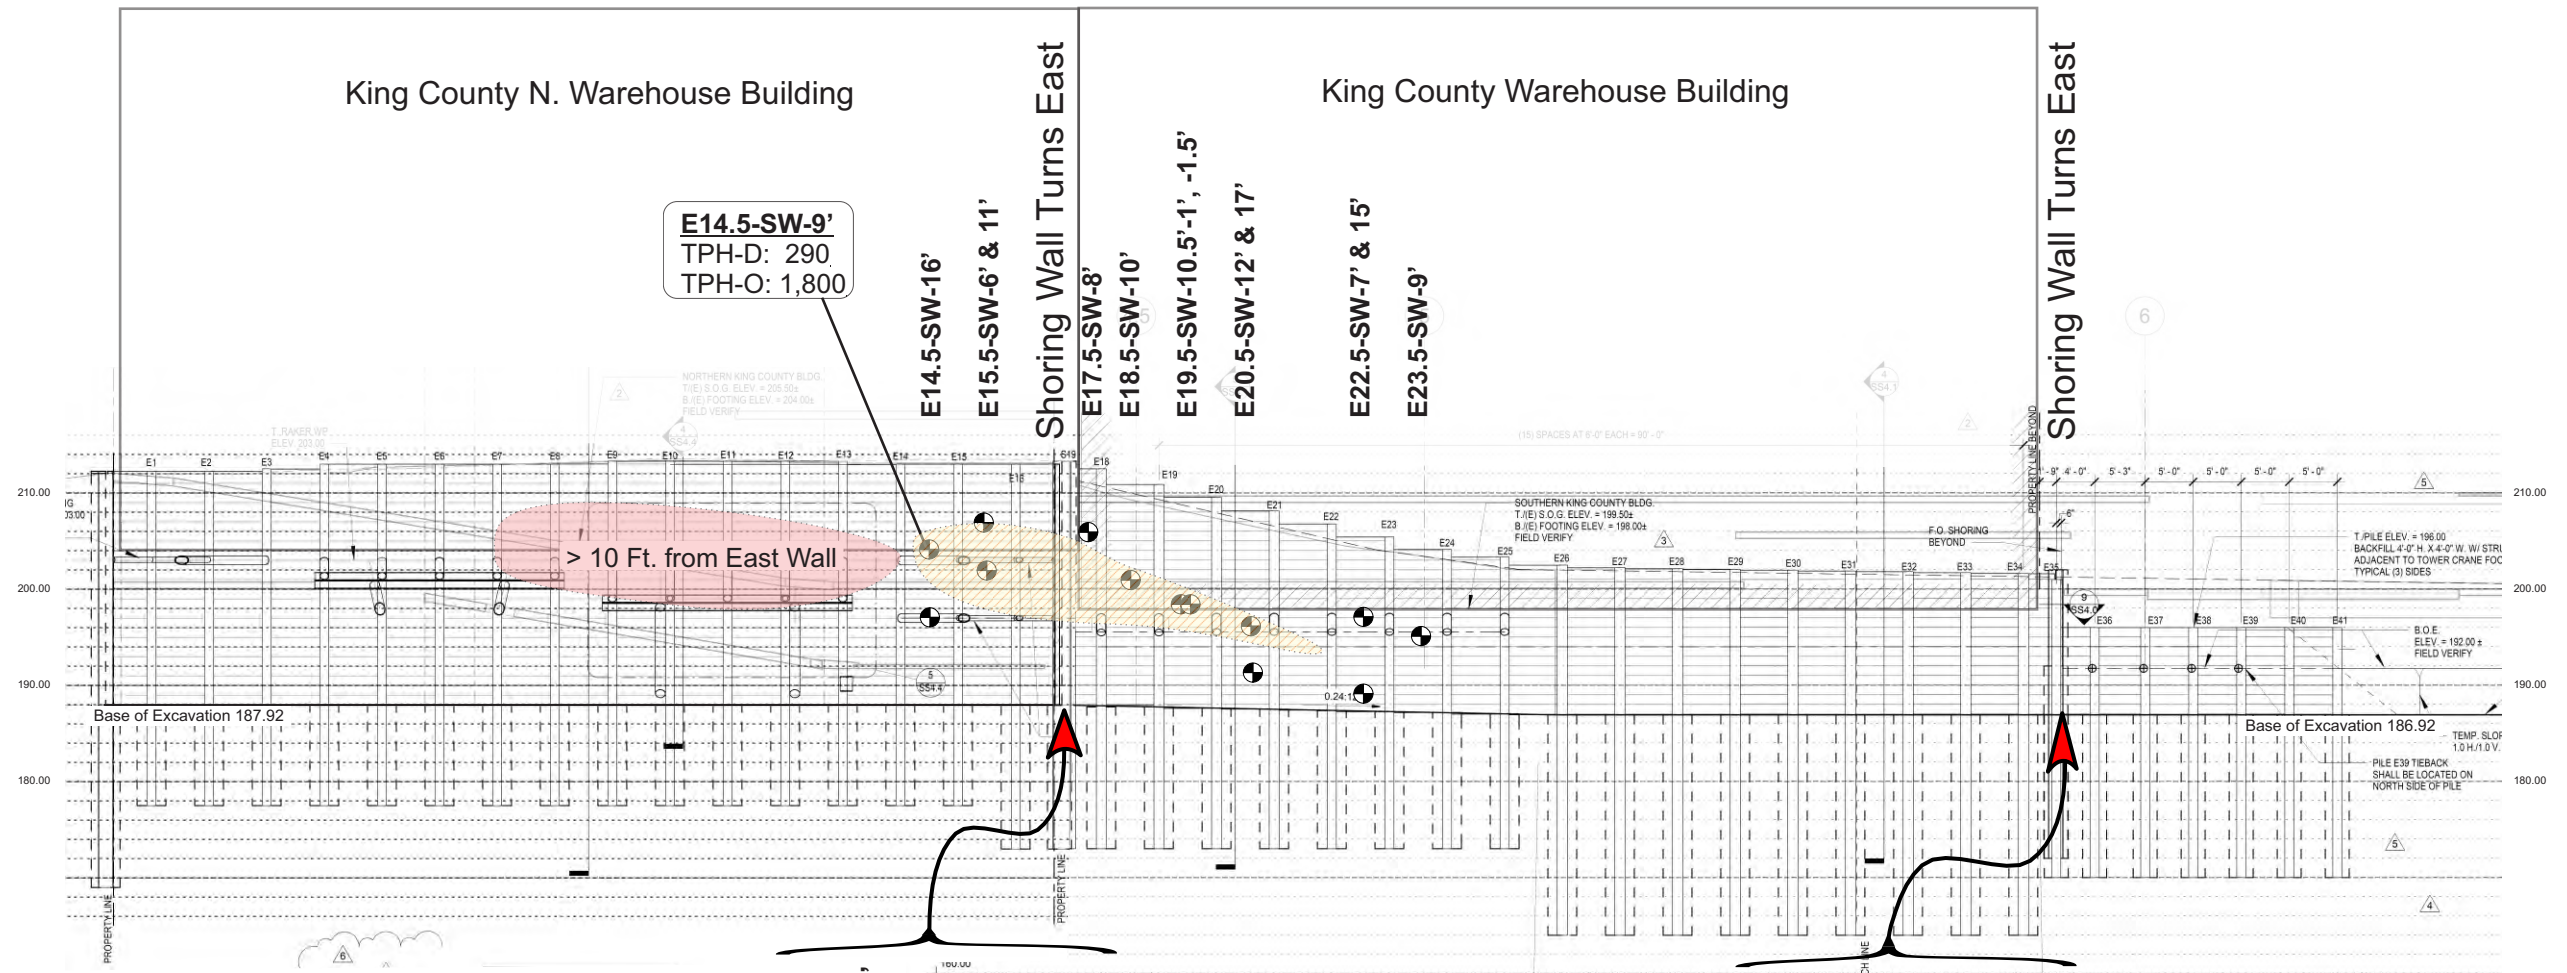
Excavation North & South Sidewall Confirmation Sample Locations
